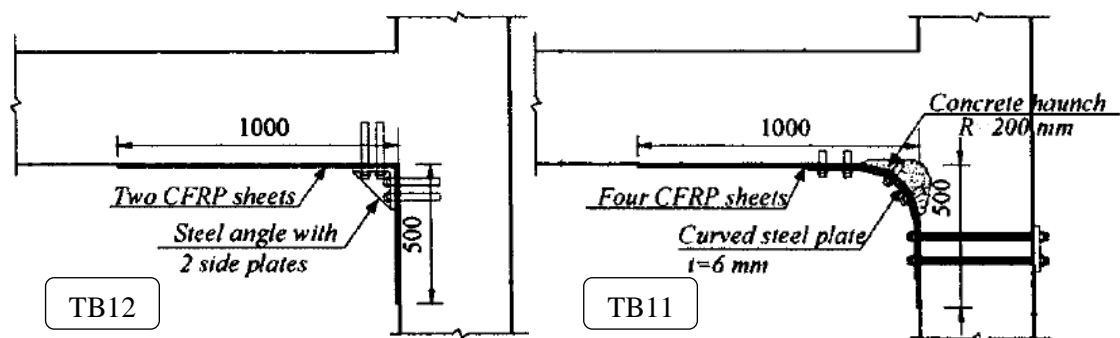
CFRP schemes for beam bar anchorage upgrade (Ghobarah and El-Amoury, 2005).
